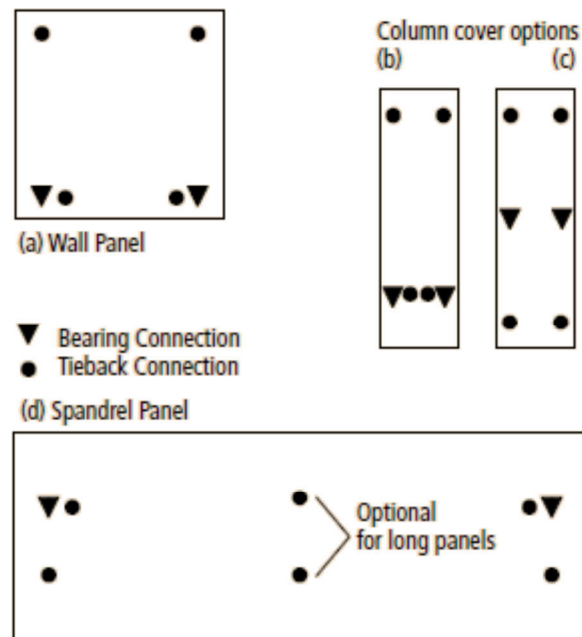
Typical cladding panel connection locations (PCI 2007)
